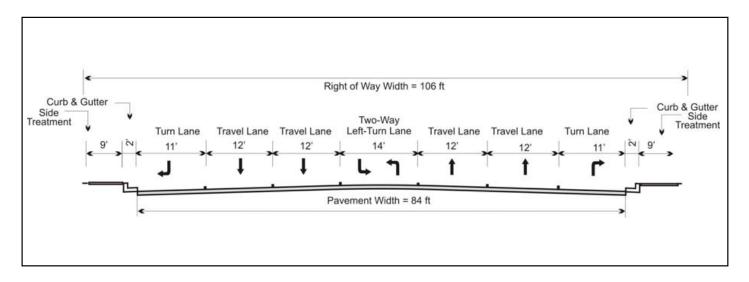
Five-lane Arterial Cross-section, At Intersections
